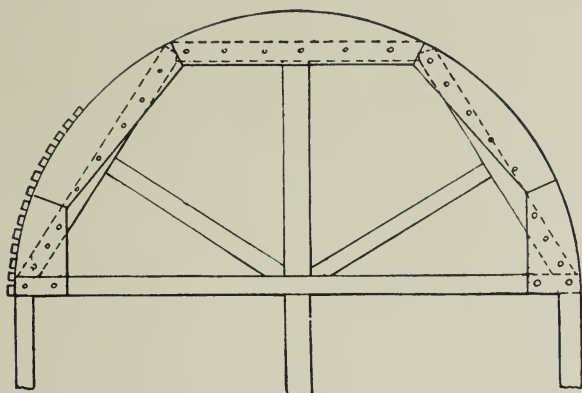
Wooden Center for Stone Arch. Construction for Spans of Ten Feet and Over.
